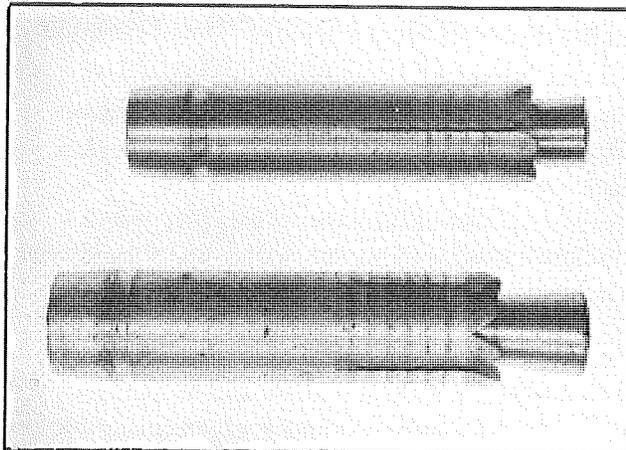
3/4-in. Arro anchor. Note worn teeth on Arro anchor (top) after failure to penetrate concrete.
